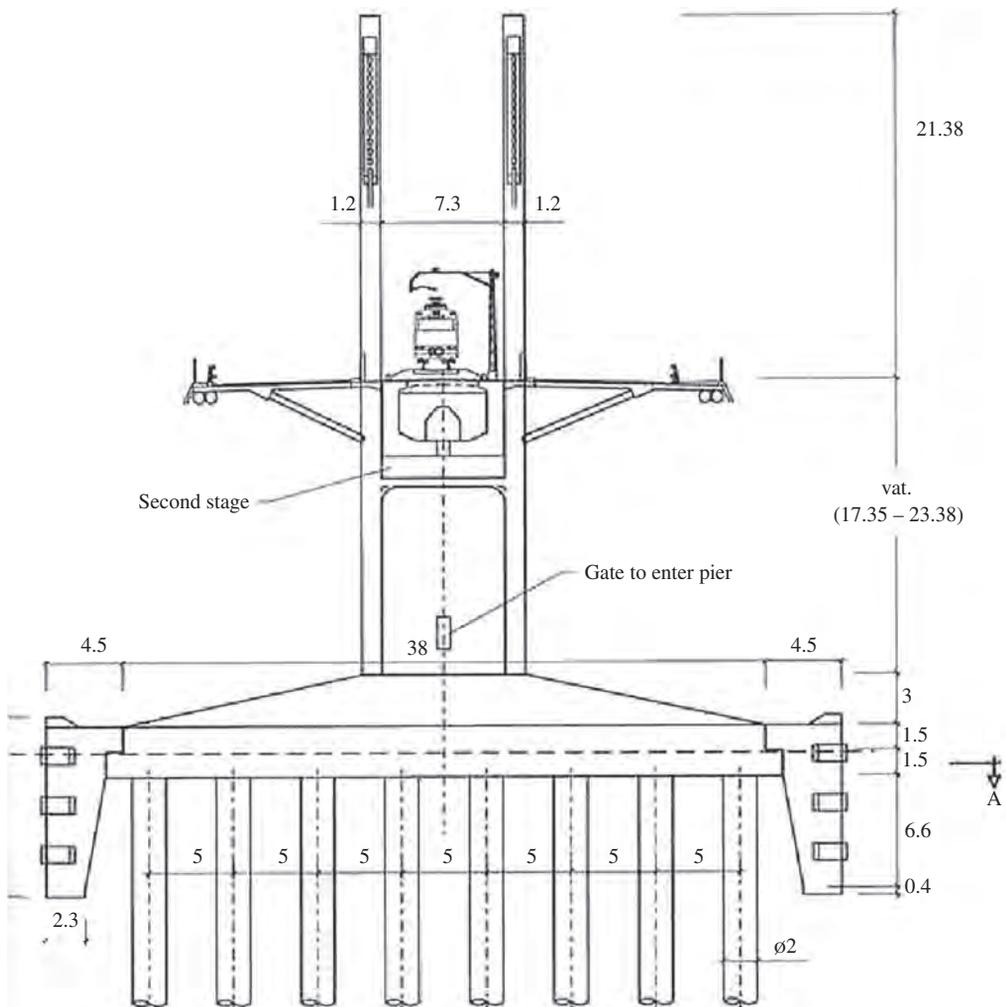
Vidin-Calafat Bridge cross section<sup>21</sup>
